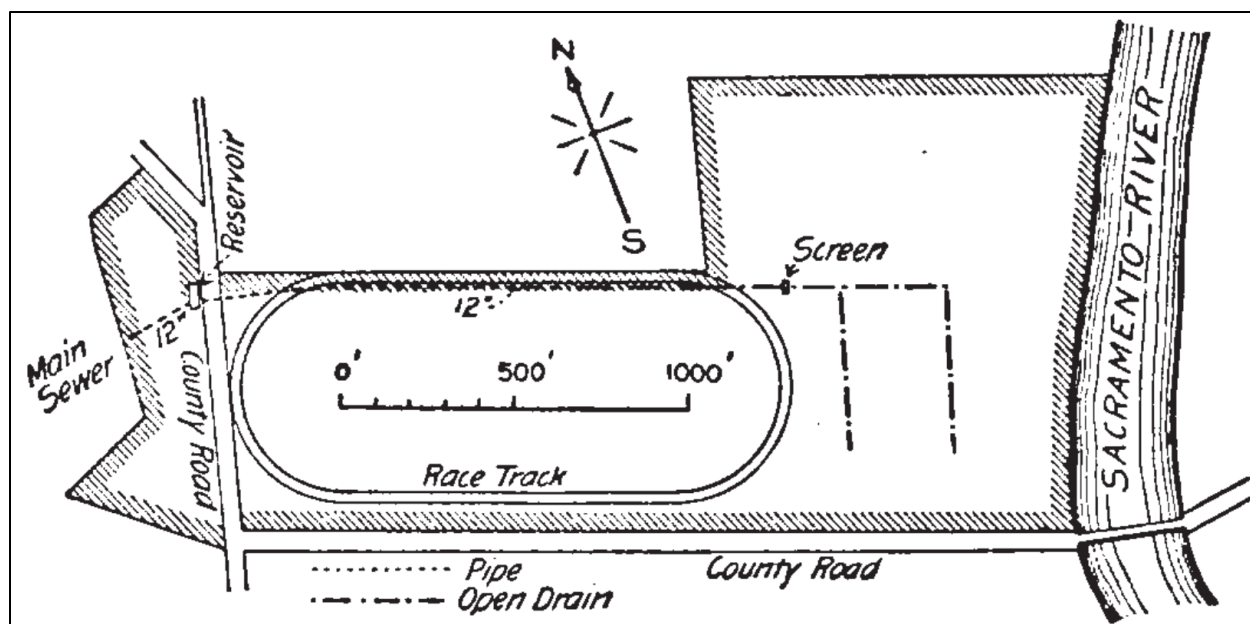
Plan of Redding sewage farm, designed in 1889.⁸⁷
